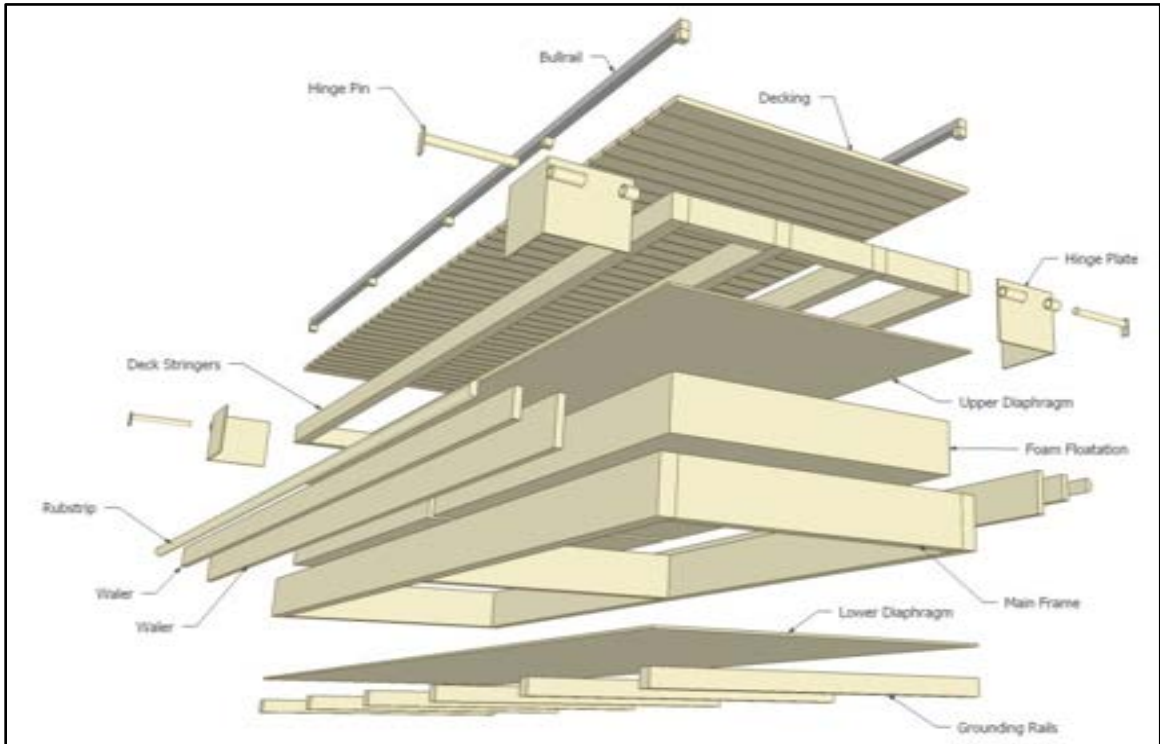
Exploded view of standard Marine Board wood boarding float design
